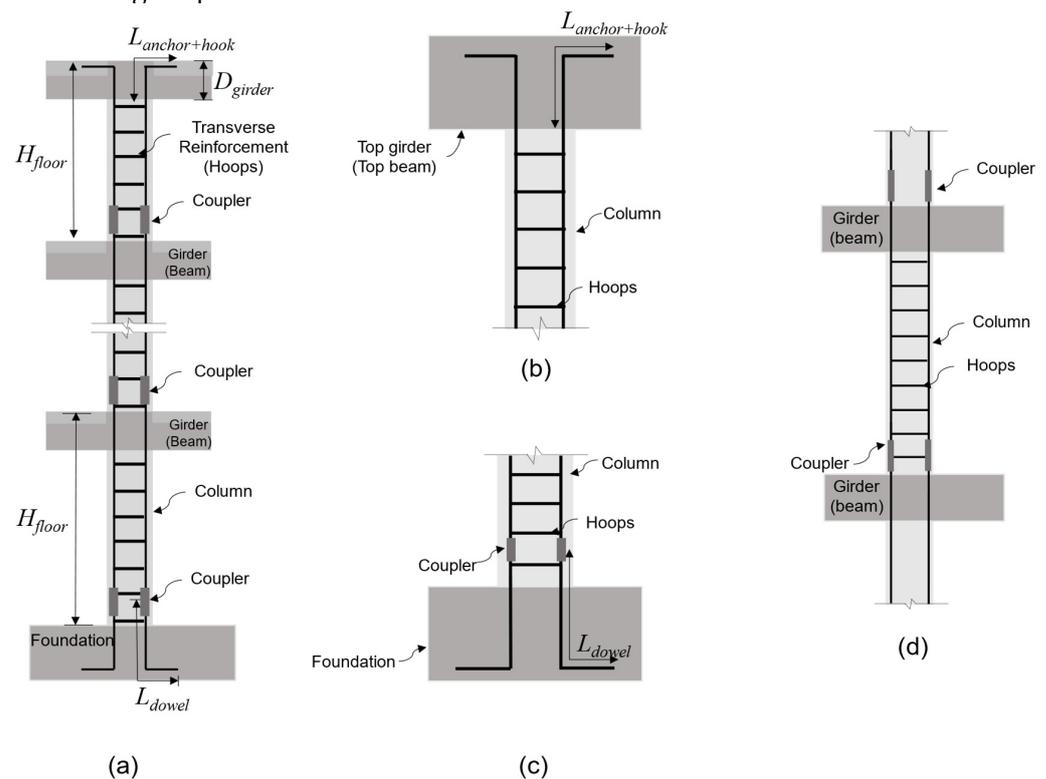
(a) Common column rebar arrangement with couplers; (b) detail of top-anchored rebar; (c) detail of foundation–column connection; (d) detail of couplers between floors (modified from [9]).
